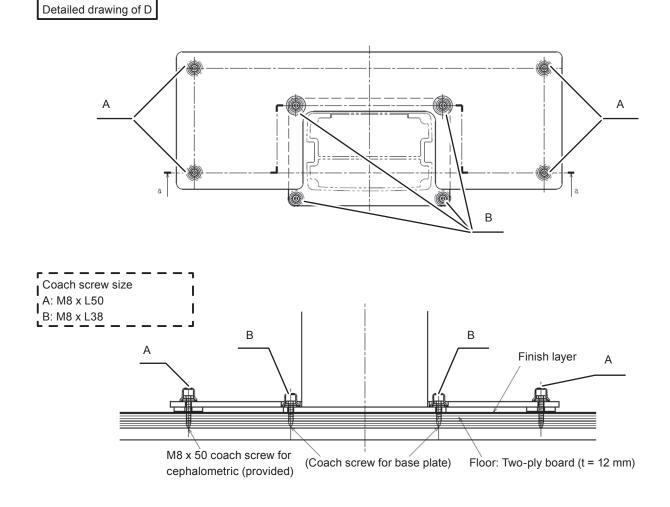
Floor fixing detail drawing D (Cephalometric type)
